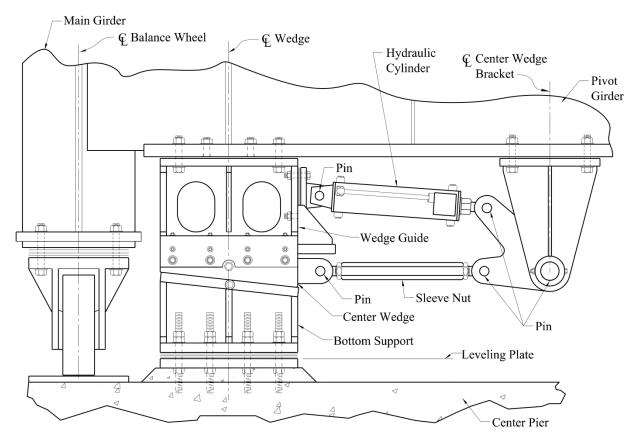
Typical Center Wedge Assembly
